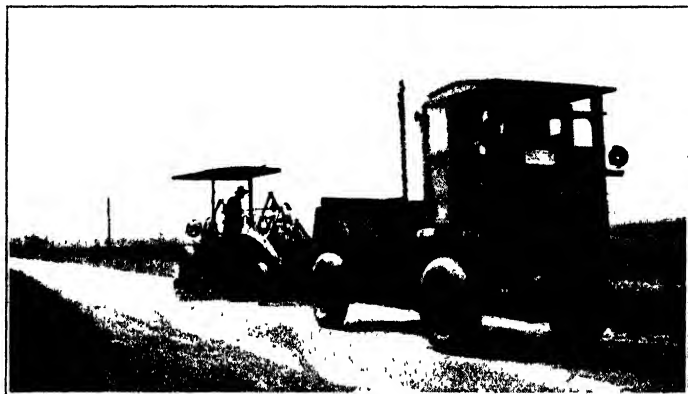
Showing the method of producing a smooth hard base on the test road prior to making the tests
